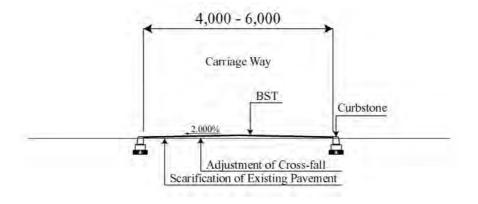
Standard Cross-Section: TAP Road in Bairiki
